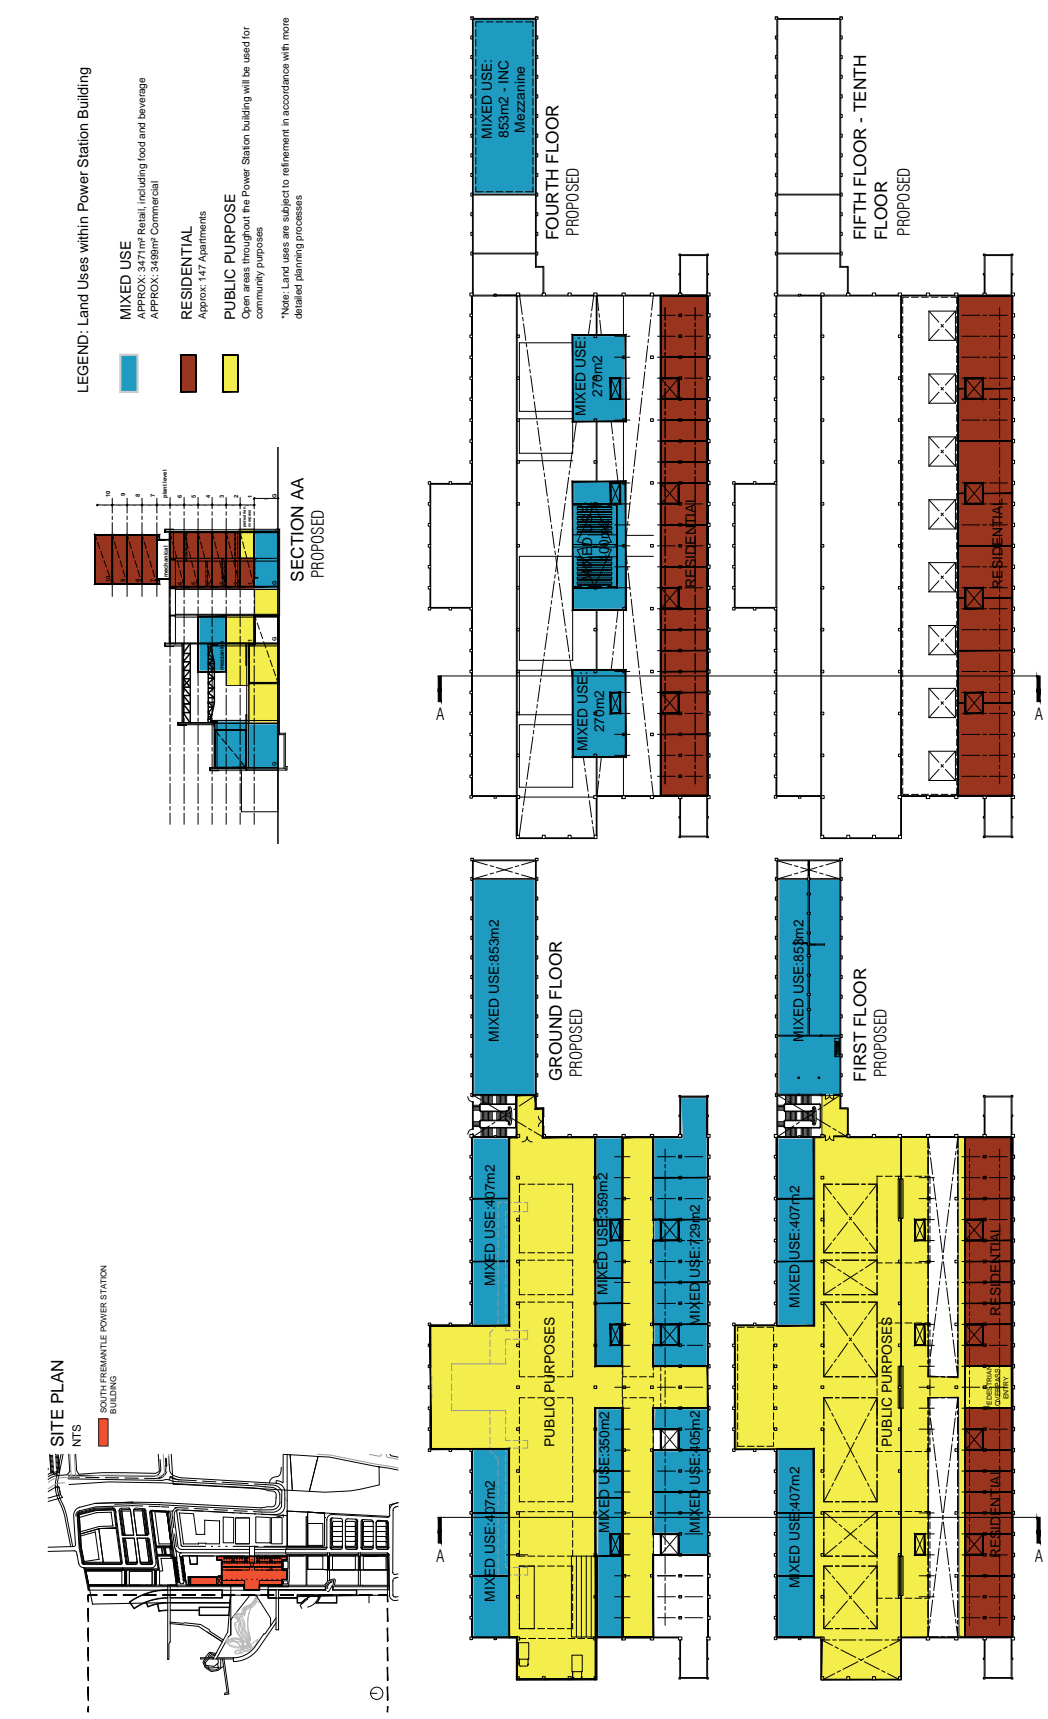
Concept Master Plan - Power Station Summary Drawings (HASSELL, 2014)
